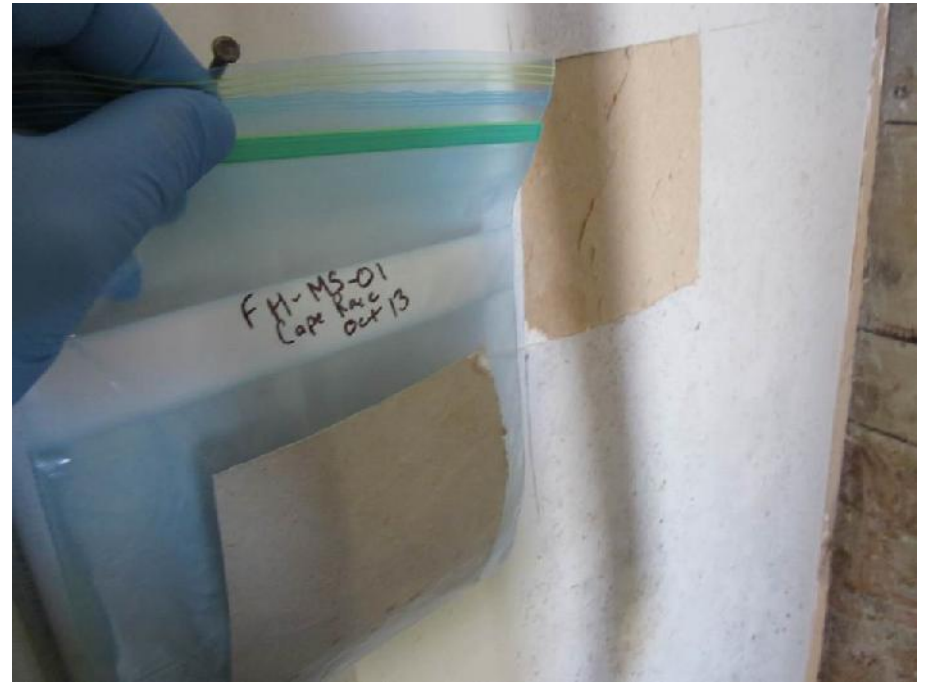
View of location of mould sample FH-MS-01 (interior wall).
